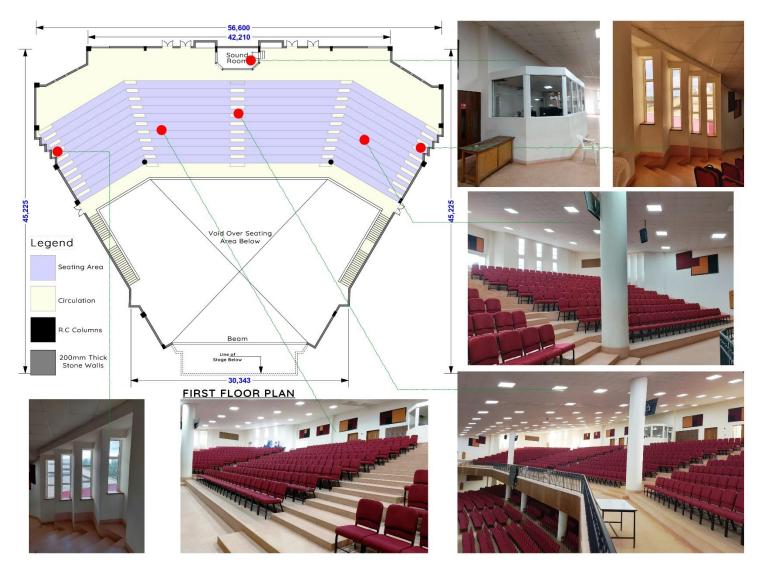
CITAM Ngong Balcony Floor Plan & Internal photographs. Copyright: Author
